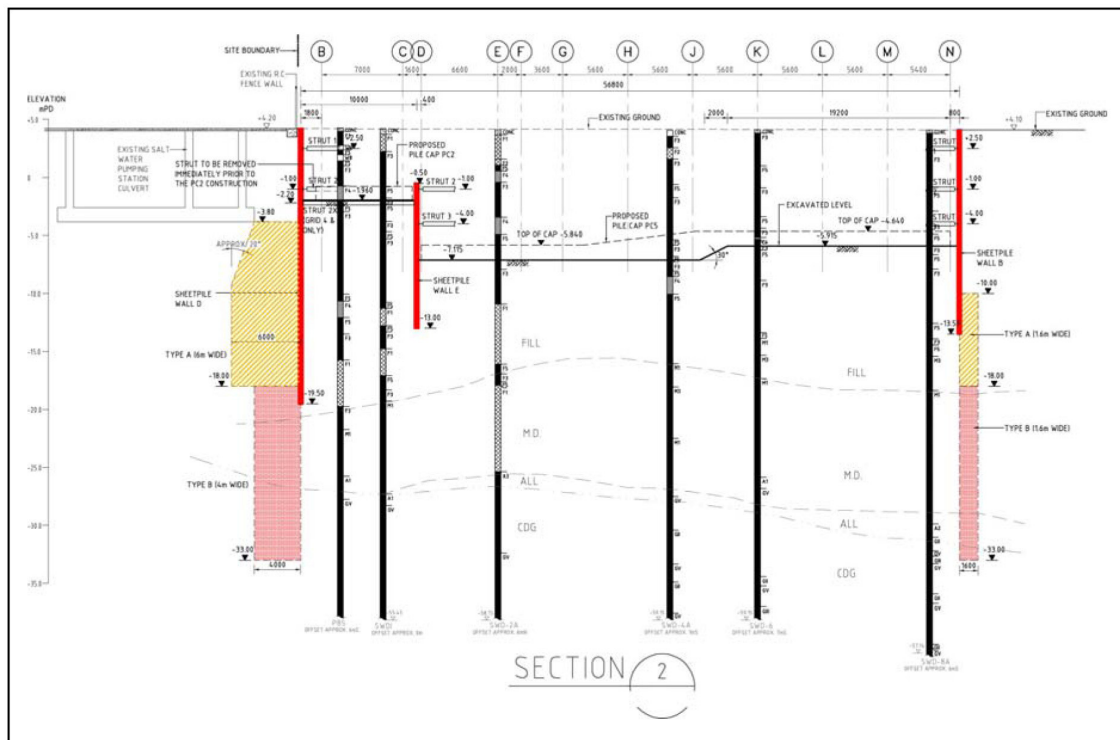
East-West Cross-section of the Sheetpile Cofferdam
